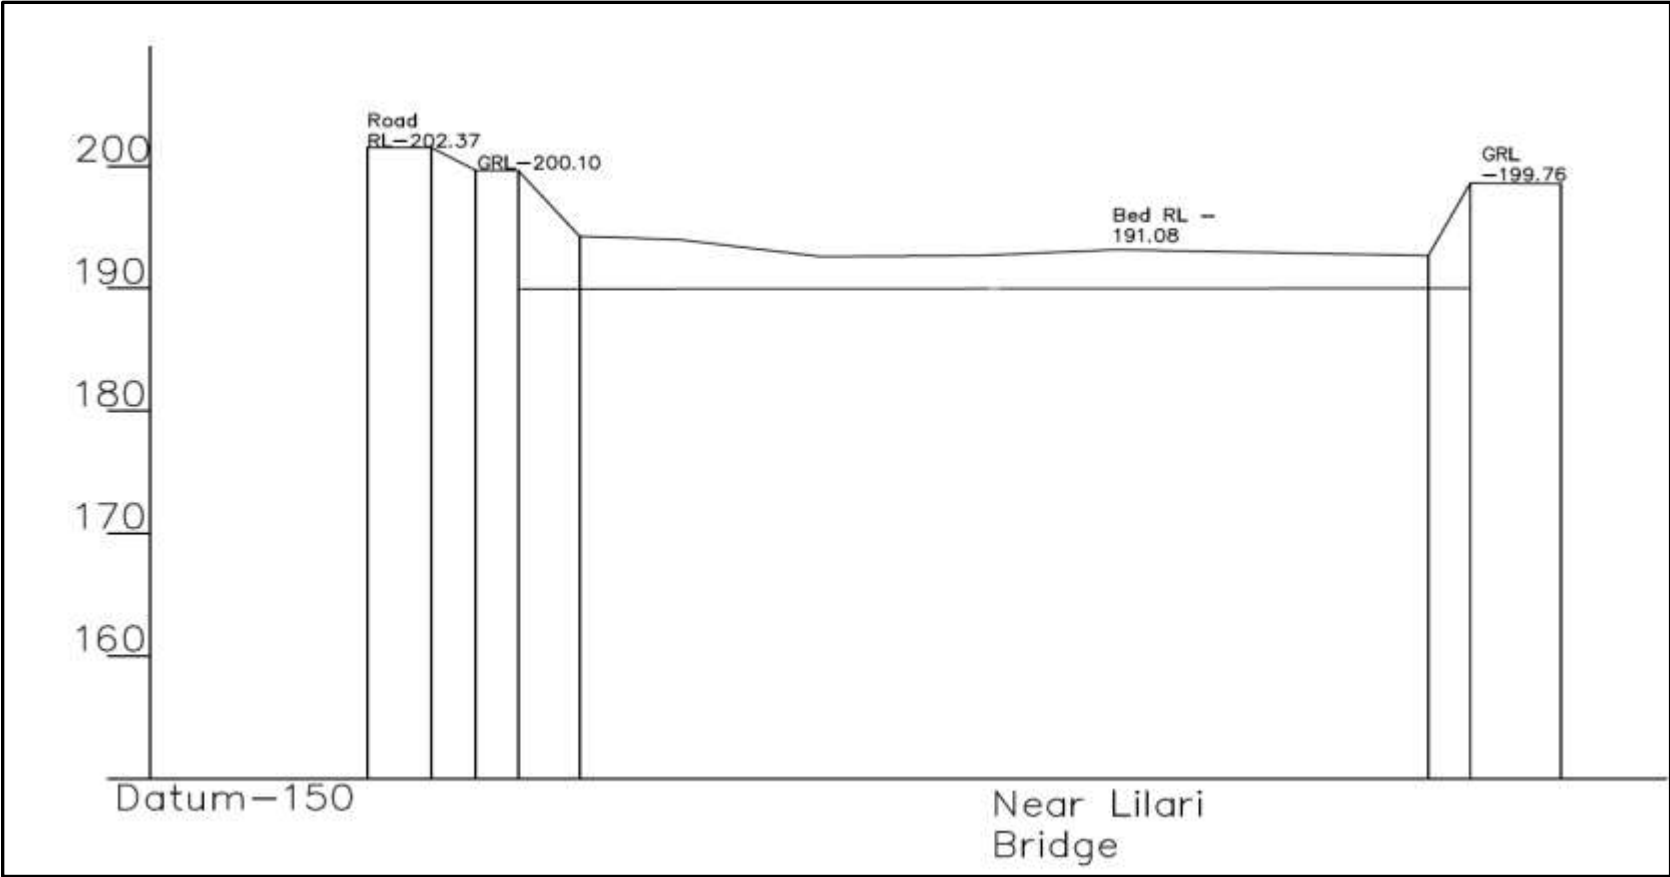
CROSS-SECTION OF NALLAH NEAR LILARI BRIDGE
